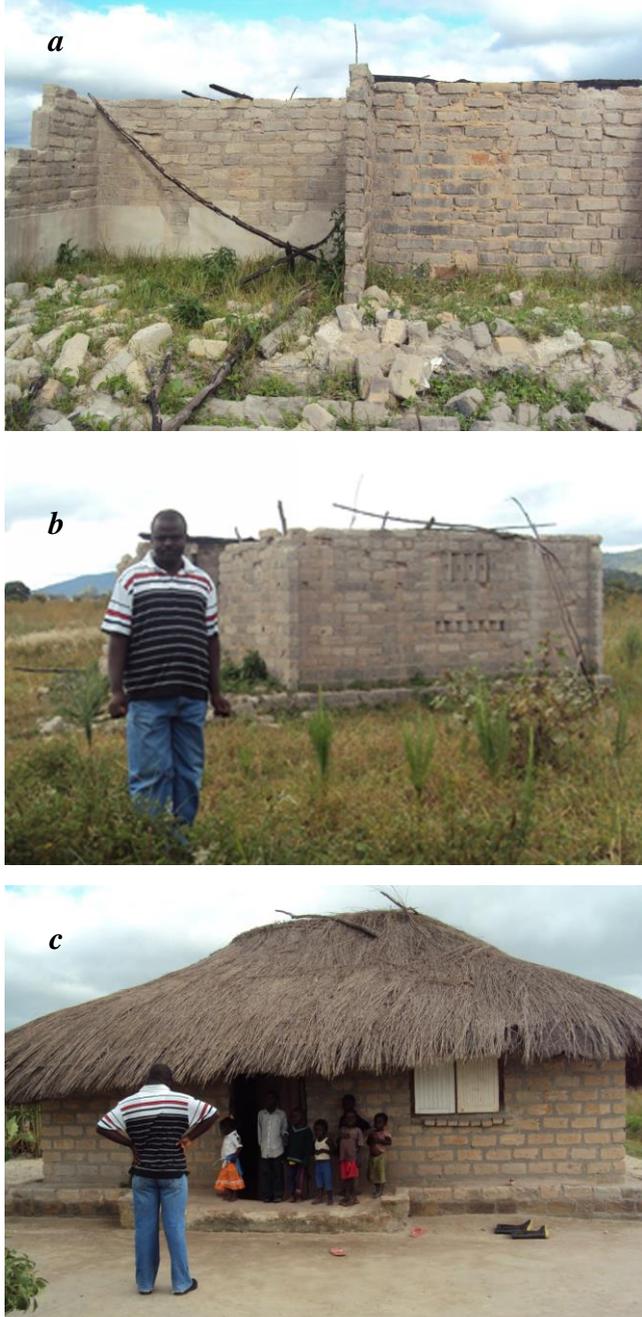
The lightning struck structure in Kasansama village, Mkushi, Zambia. *a.* The close up of the building. *b.* Building at a distance. *c.* A neighboring building, very similar in dimensions and structure to the affected one (Adopted from [4]).
